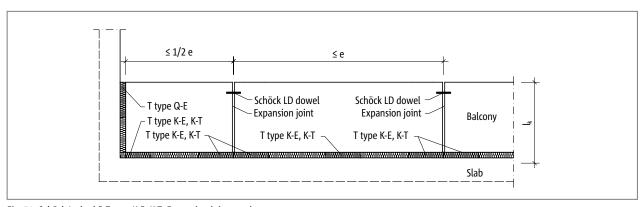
Schöck Isokorb® T type K-E, K-T: Expansion joint spacing
